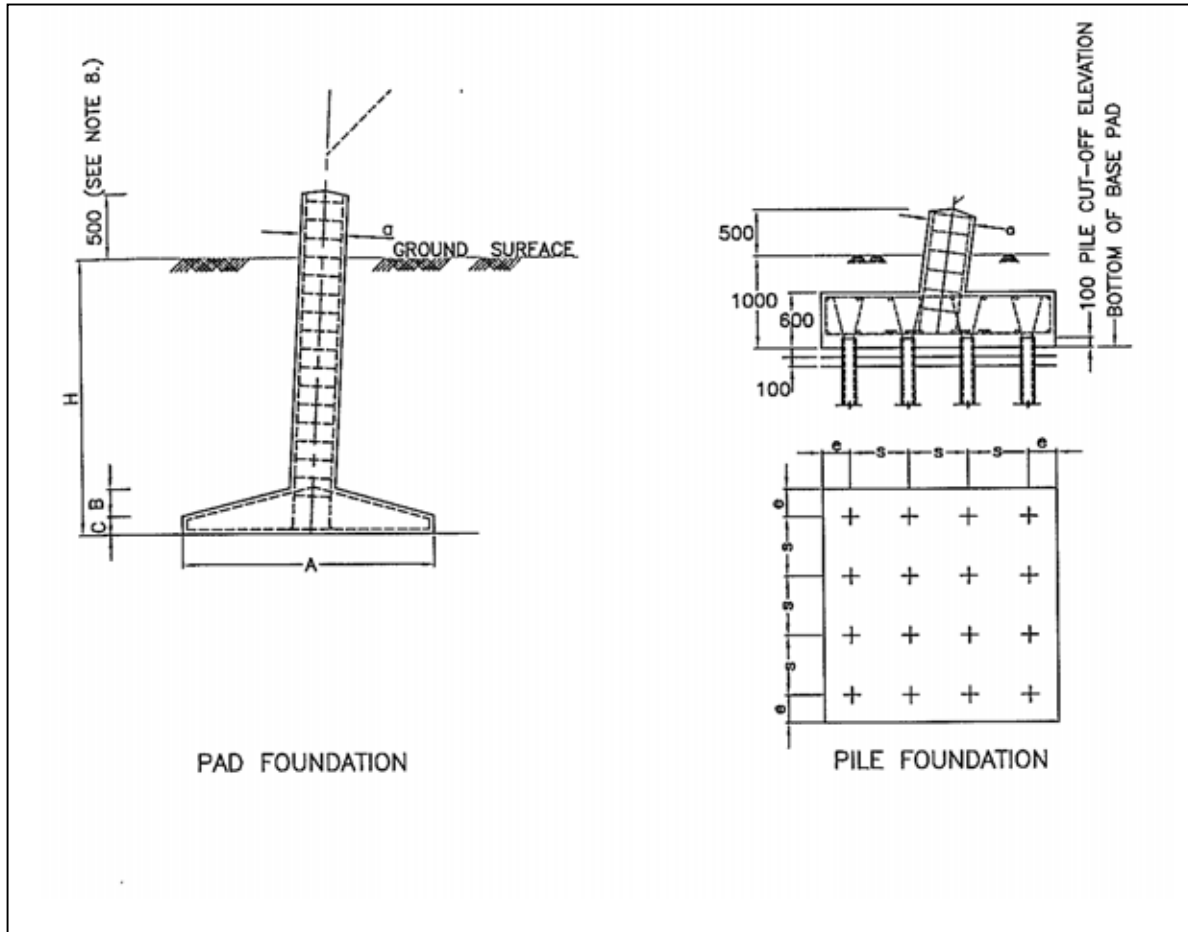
500kV, Tower Foundation (Pad and Pile Type)
